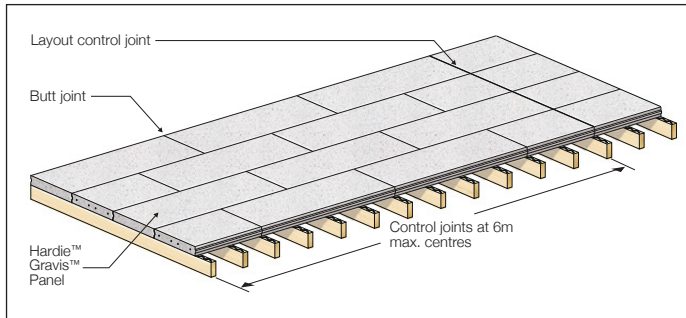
TYPICAL FLOORING PANEL LAYOUT
